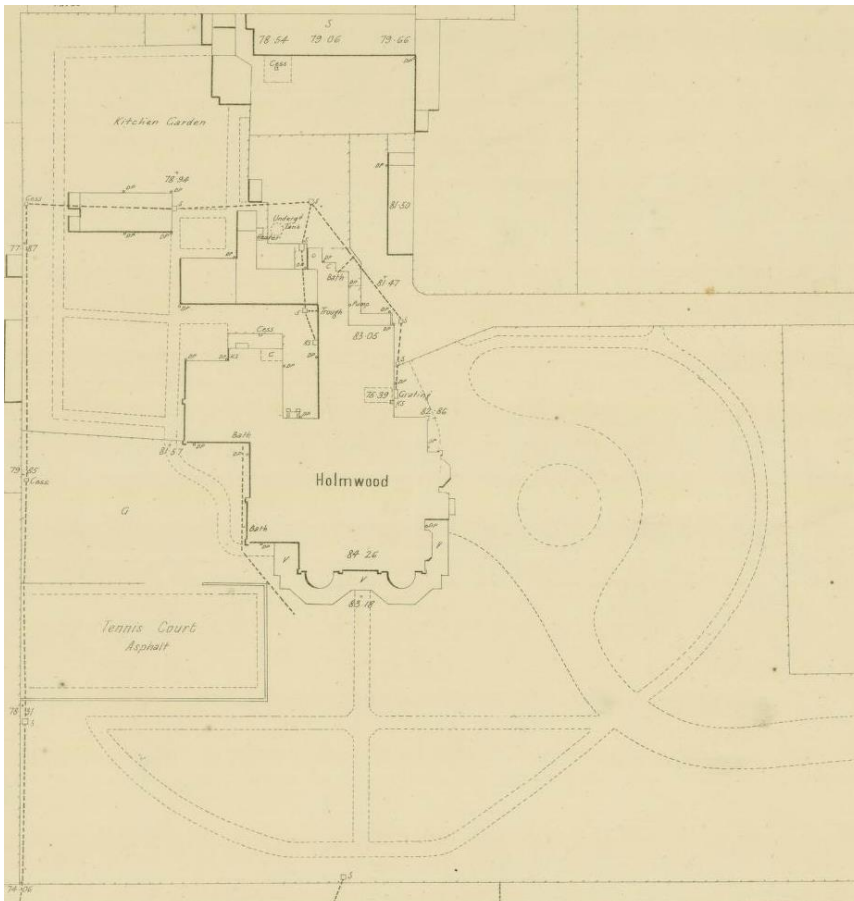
Extract from MMBW Detail Plan no. 1420 showing 'Holmwood' in 1900
